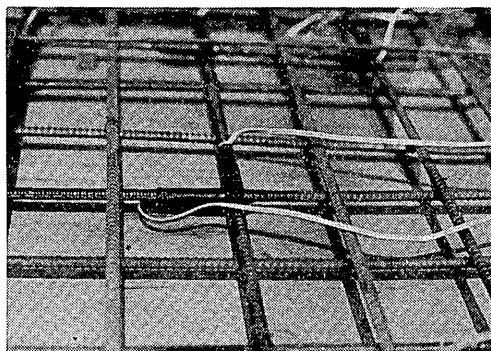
Strain Gauge at Reinforcing Steel Bar
